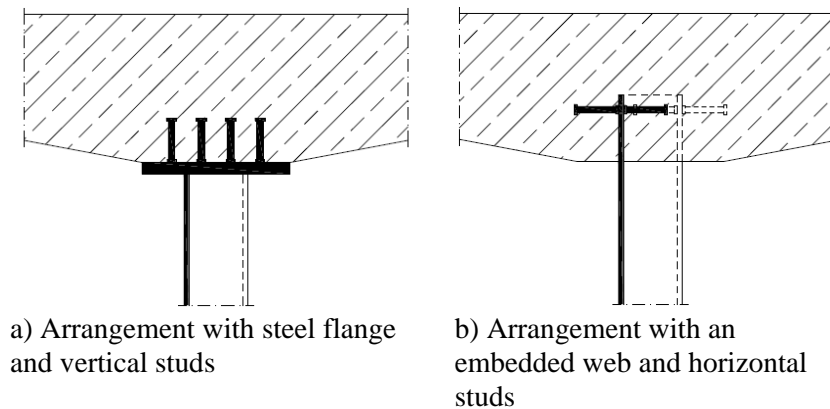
Basic arrangement options of compound joints between steel corrugated web and concrete flange [16] p.140
